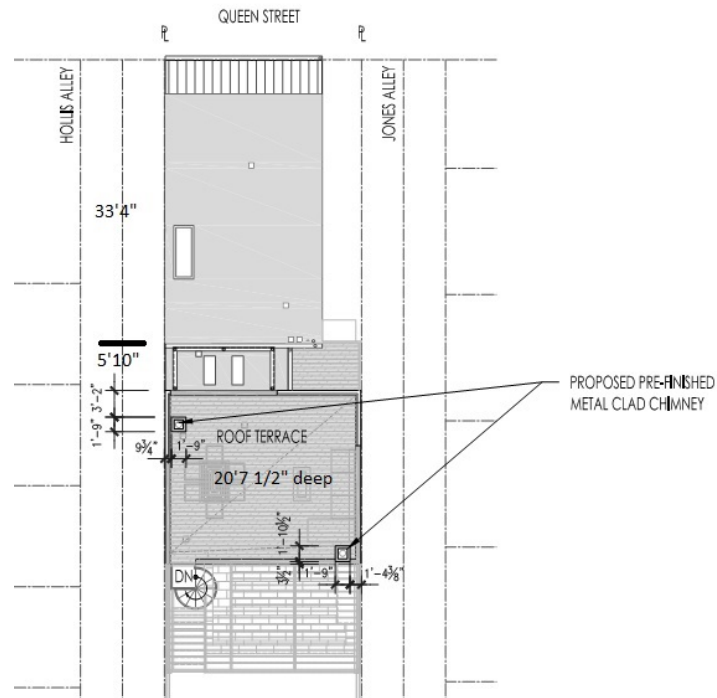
Roof plan showing distance of chimneys from Queen Street elevation
